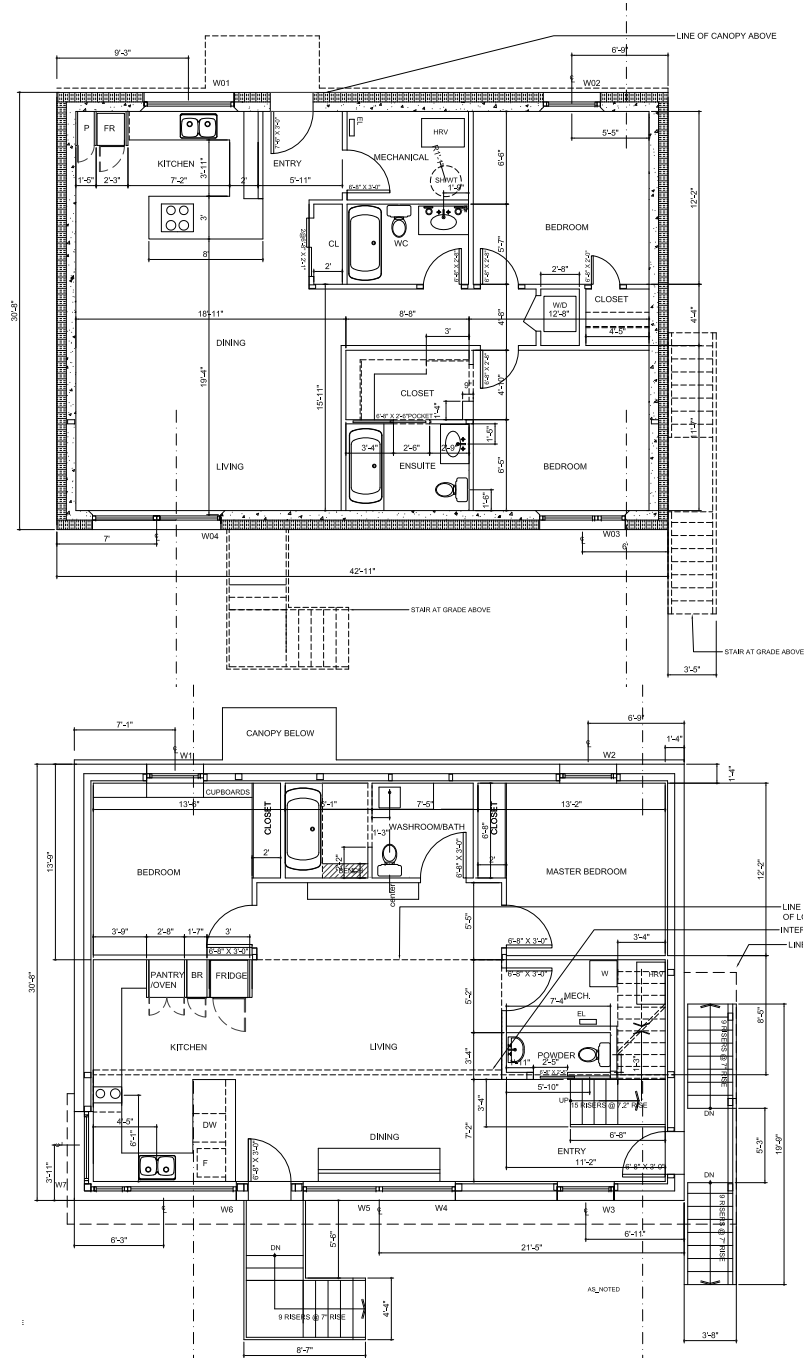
Basement (upper) and Main Floor (lower) Floor Plans (adapted from LVDesign, 2014).
